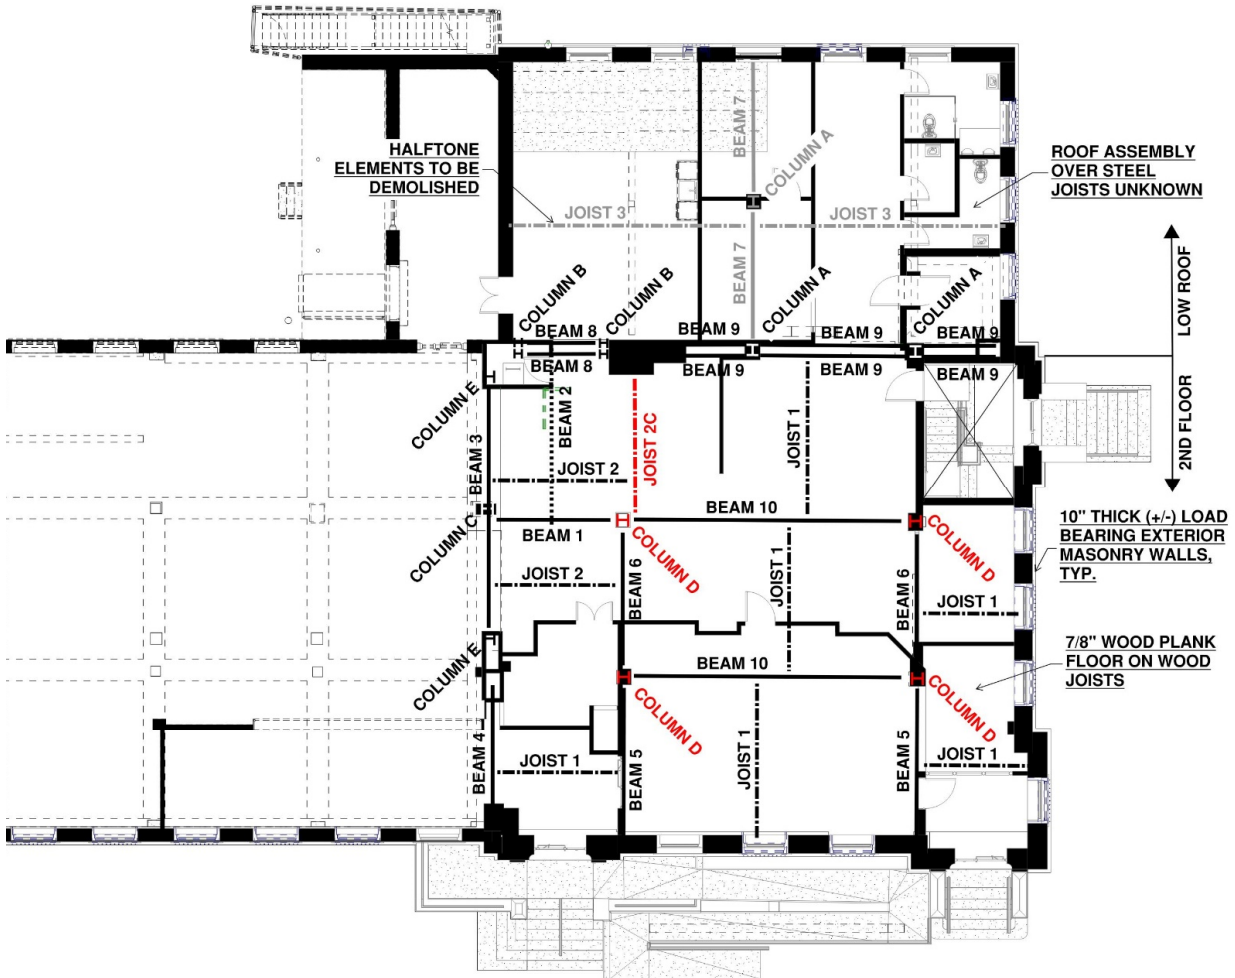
A: Second Floor and Low Roof Framing Plan. Structural elements shown in red require reinforcement, see Figure 3B.
